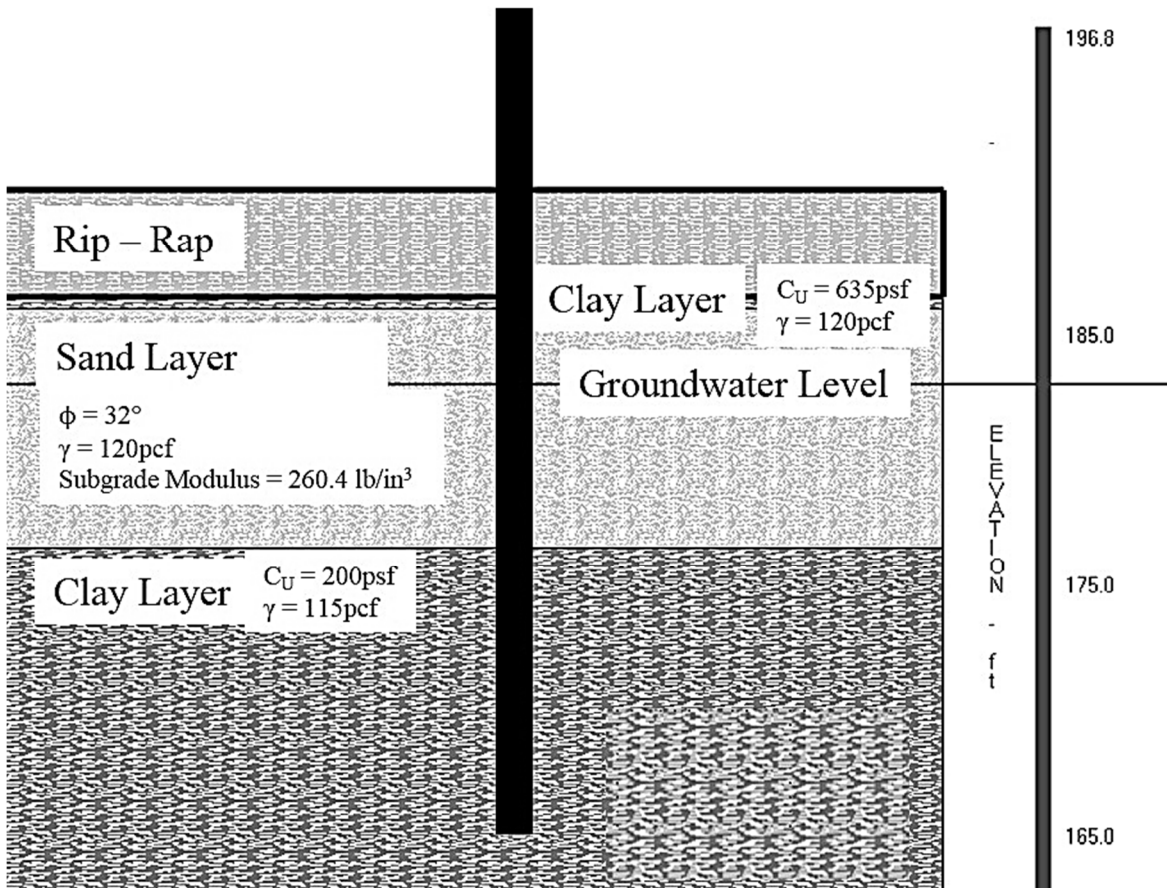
Macon County Road 9 Bridge Soil and Pile Profile (Adapted from FB Multiplier)
